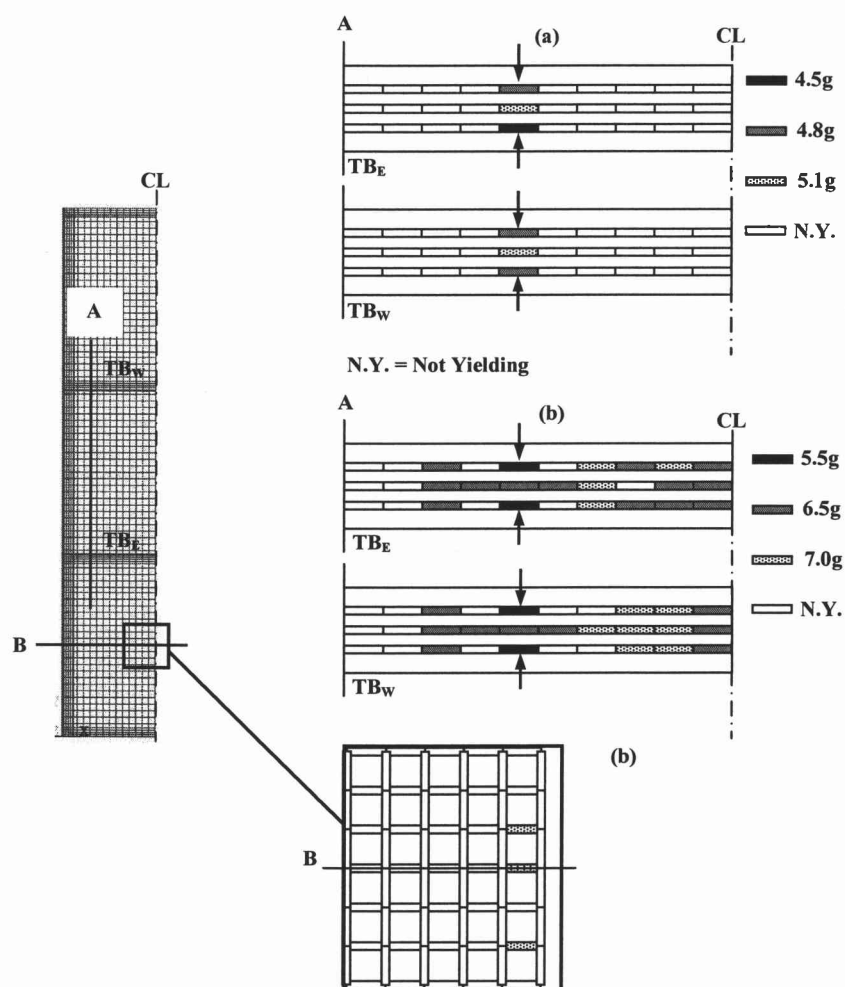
Yielding in Reinforcing Steel (Scaled Gravity Loading): (a) Unstrengthened Bridge; (b) FRP-Strengthened Bridge
